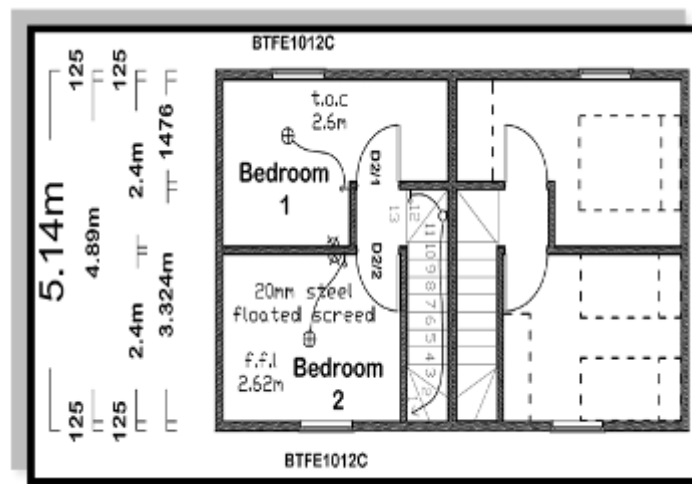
TYPOLOGY C – FIRST FLOOR PLAN
